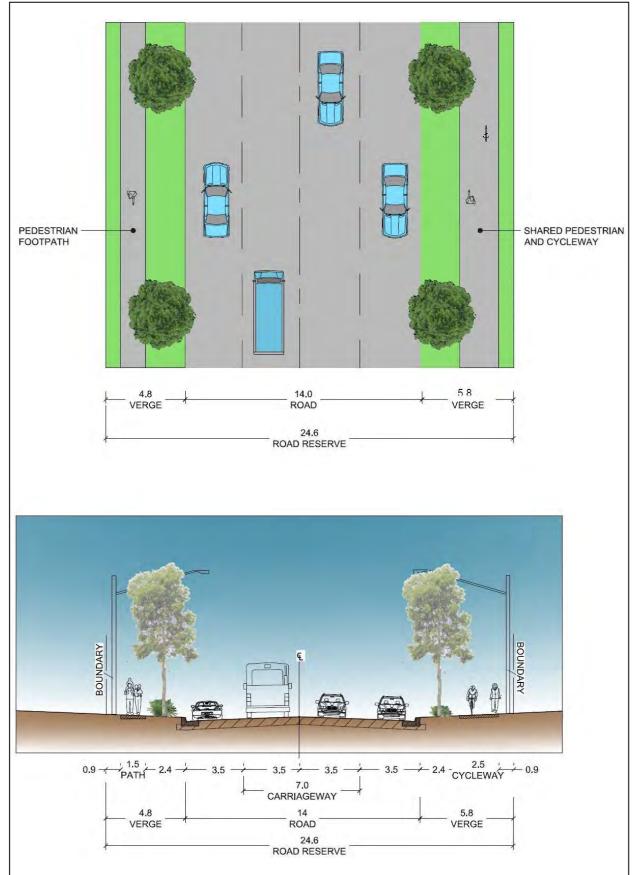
Typical street cross section – East-West Road (Eastern Section)
